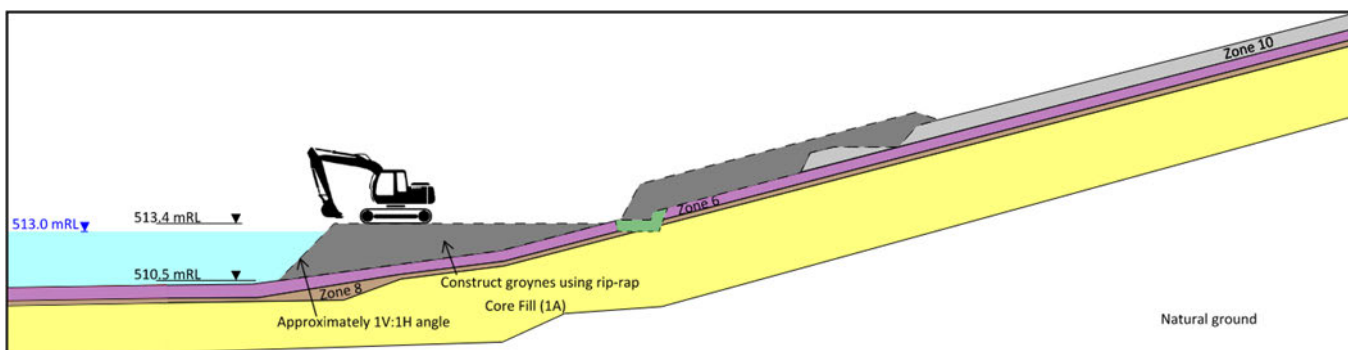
Schematic sketch – Tranche 2 – abutments – construction of groynes
